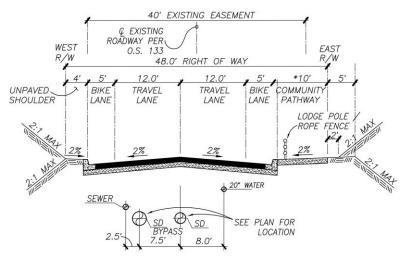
Street Section 10A – Proctor Valley Road Modified 2-Lane Light
